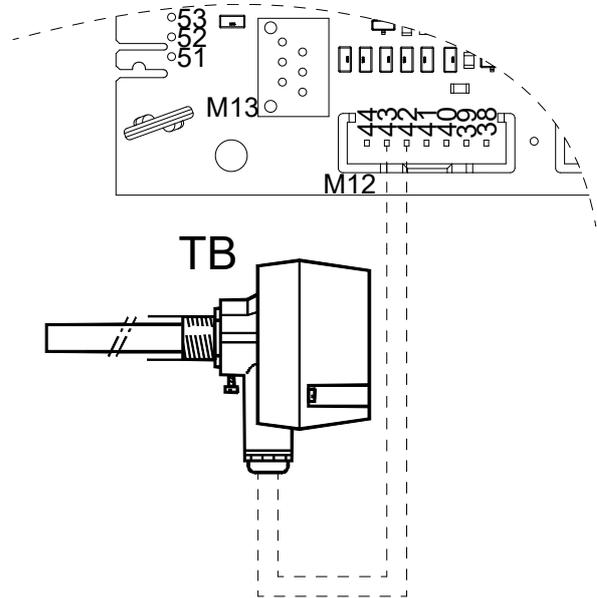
Connection of OSND011 DHW buffer tank probe
